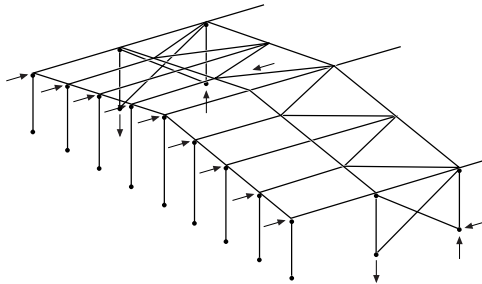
Transfer of wind loads from gable columns through roof and wall bracing. (STEP 1995 Article D9)
